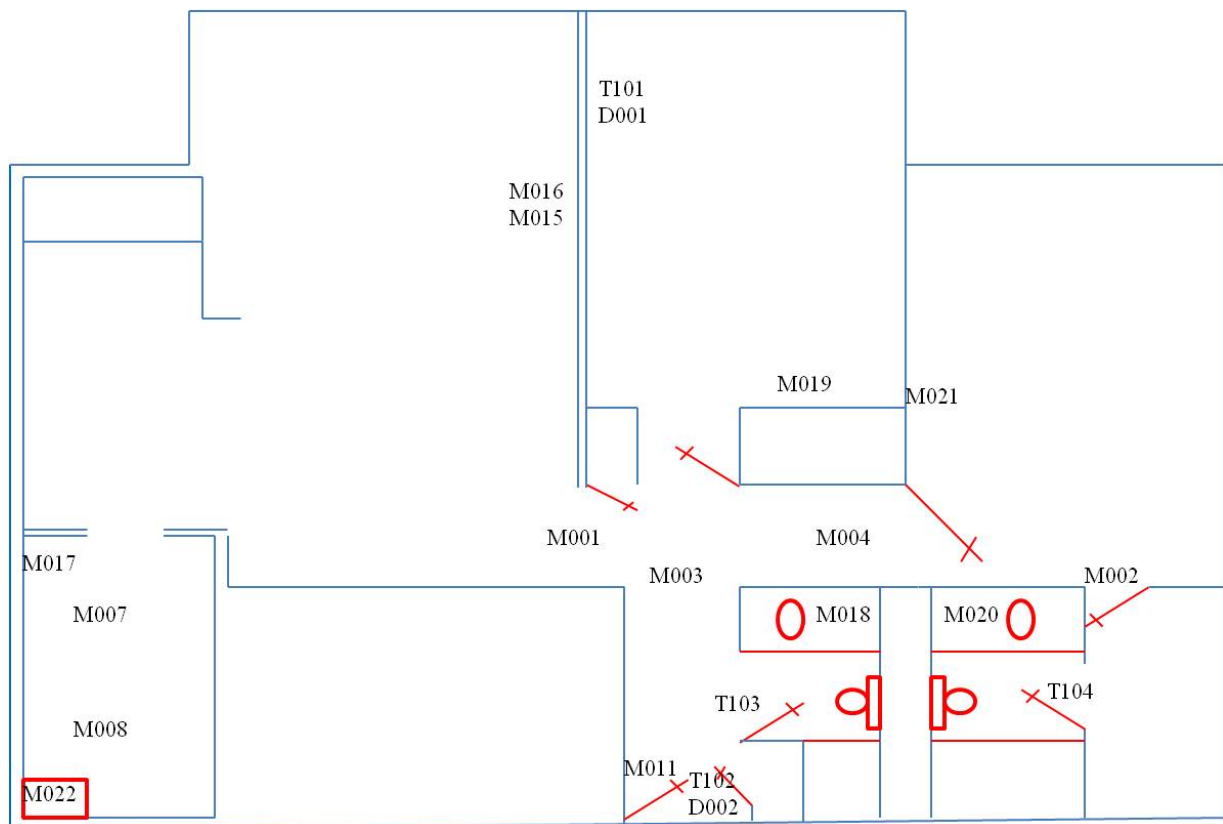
Floor plan and sensor placement for the testbed hh125.
